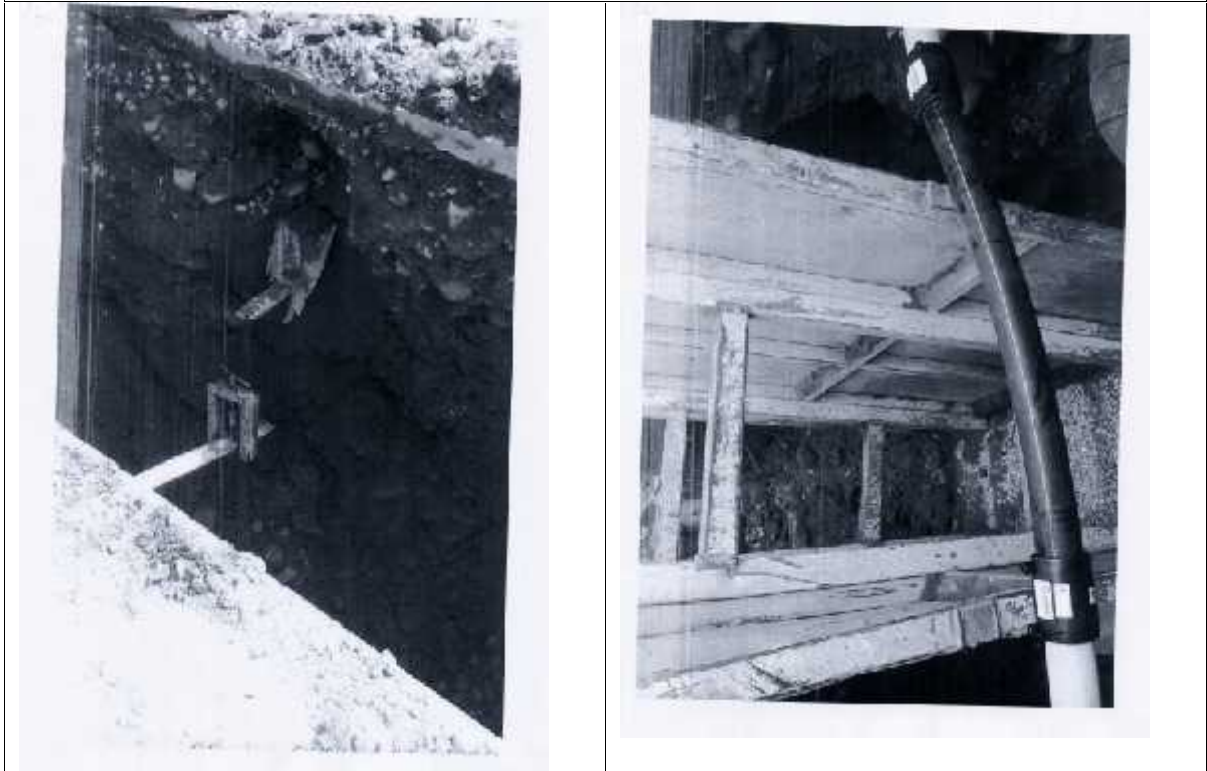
Damaged underground infrastructure and the same section after rehabilitation – Konstitutsia Str.
